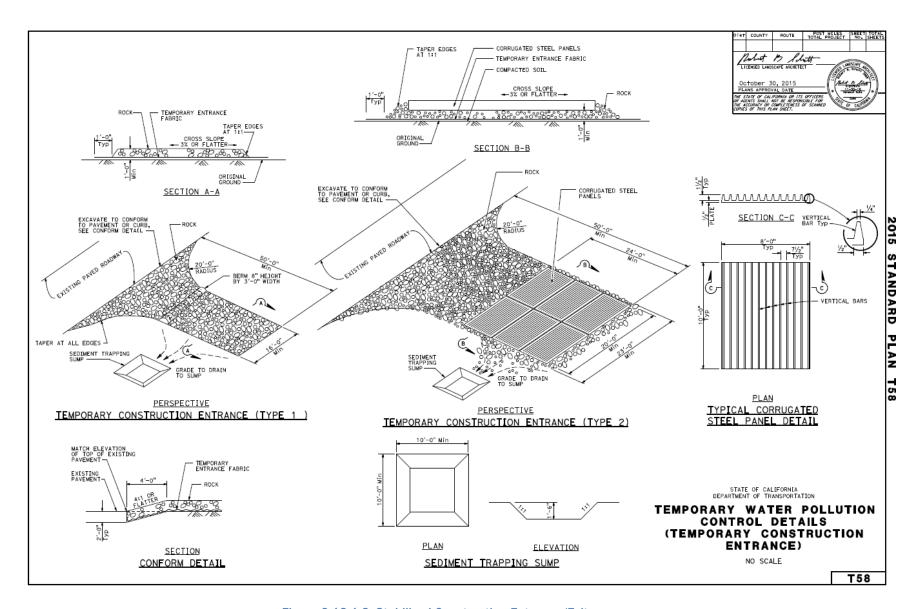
Stabilized Construction Entrance/Exit
